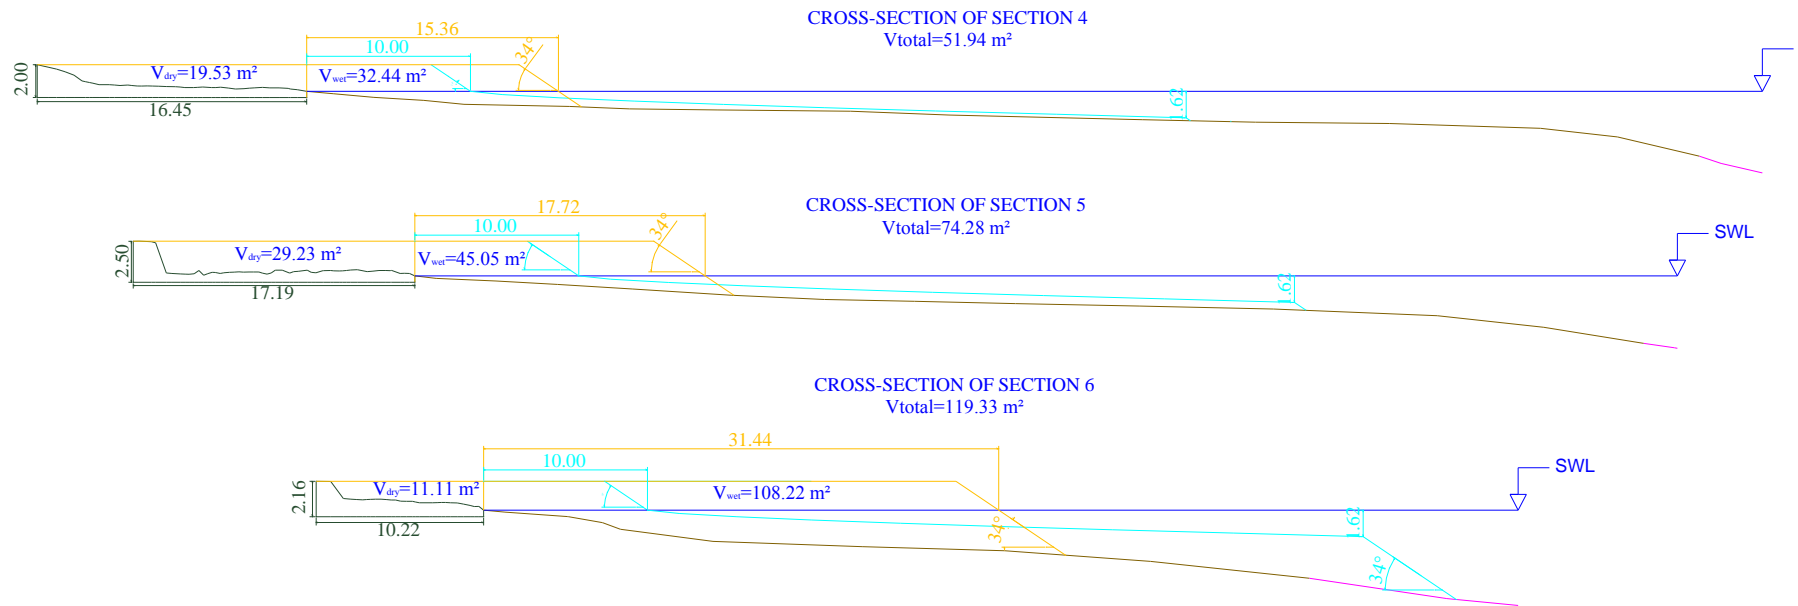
Design profiles of Section 4,5 and 6 for 10 m new dry beach width ($D_{fill}=0.32 \text{ mm}$).
